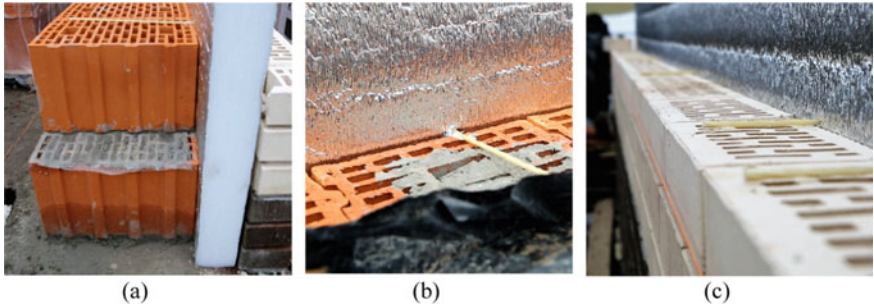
Layered brickwork: a - layout of materials in layered masonry; b - view of the masonry from the side of the bearing wall; c - view from the side of the outer cladding
